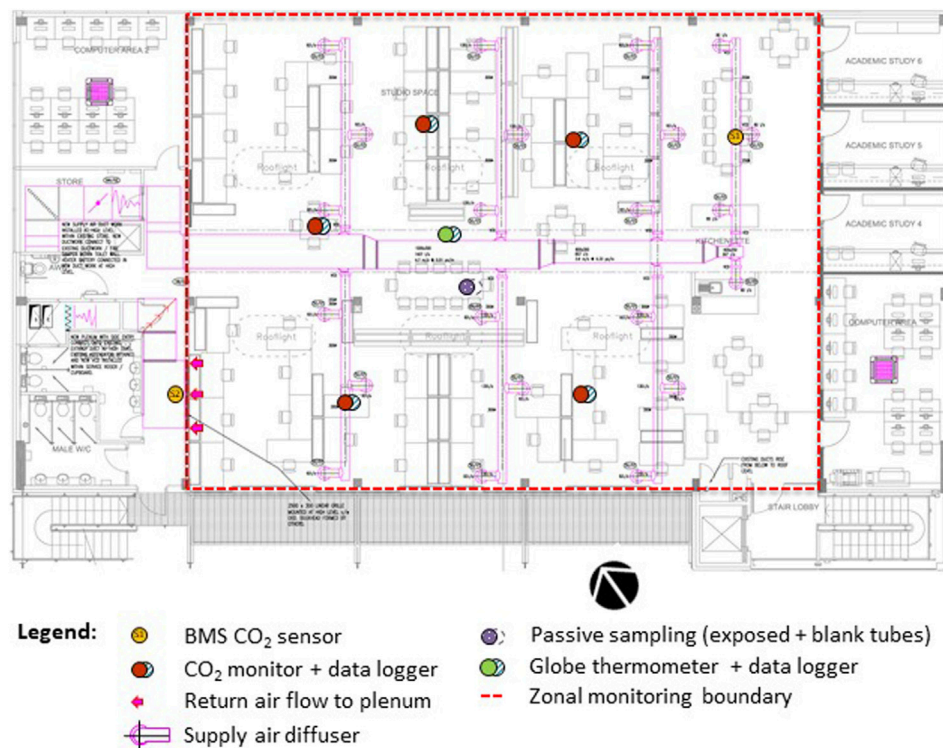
| First-floor plan showing ventilation ductwork layout (magenta) and the positions of monitoring and sampling devices.
